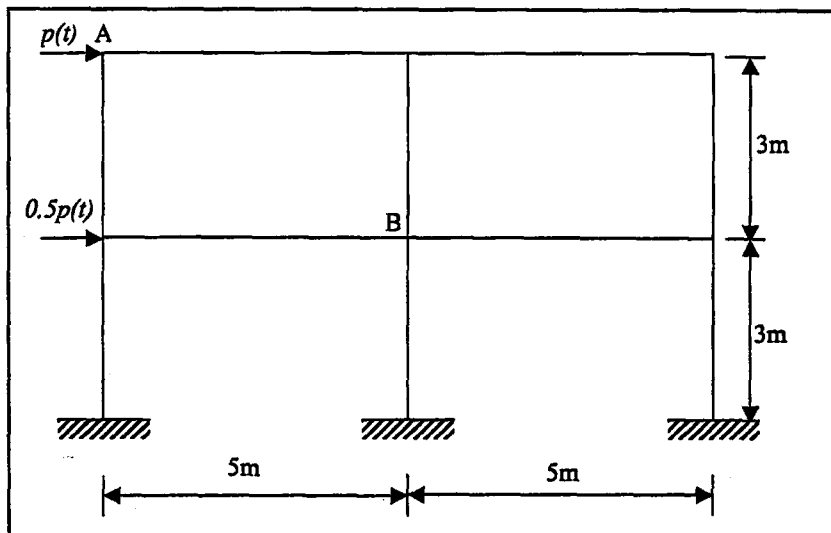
Geometry of two bay-two story reinforced concrete frame
